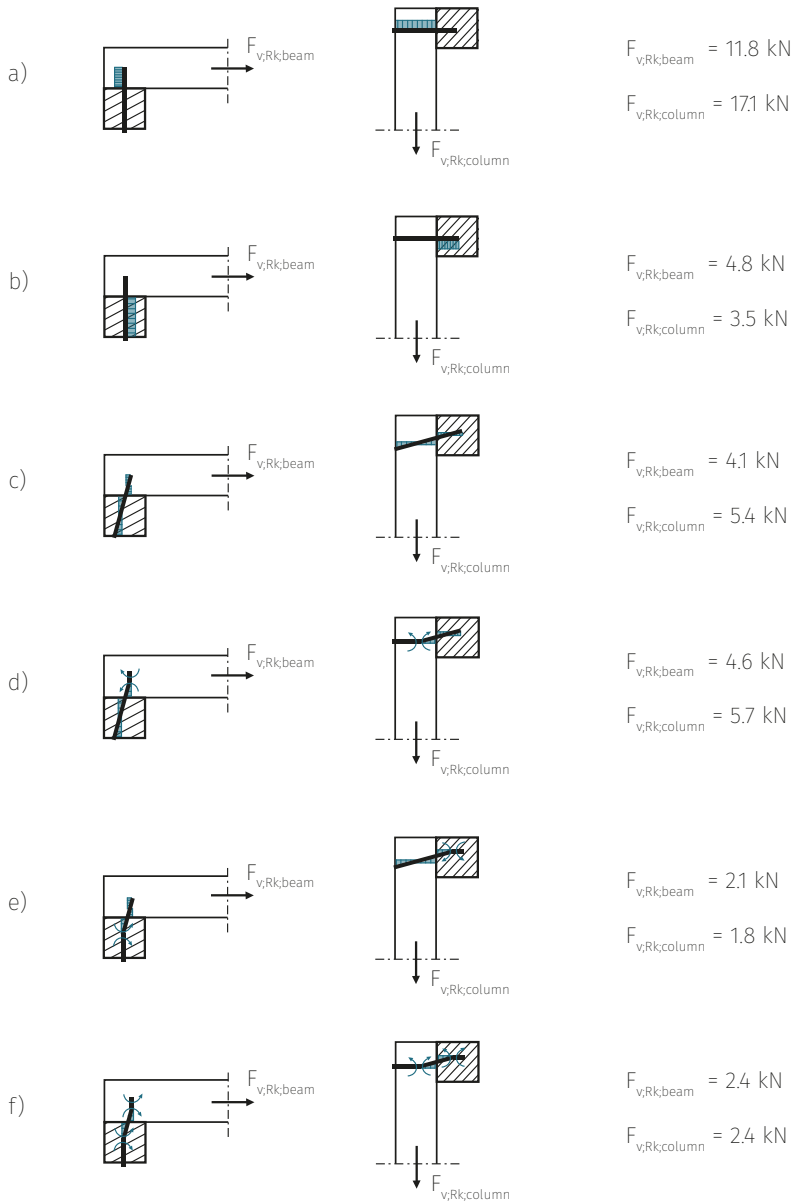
Failure modes of the joint for the tensile force applied in the beam (left) and in the column (right), with their corresponding capacity per fastener
